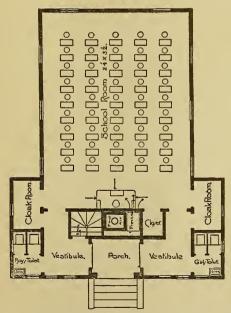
Floor Plan of Model One-room Schoolhouse.
